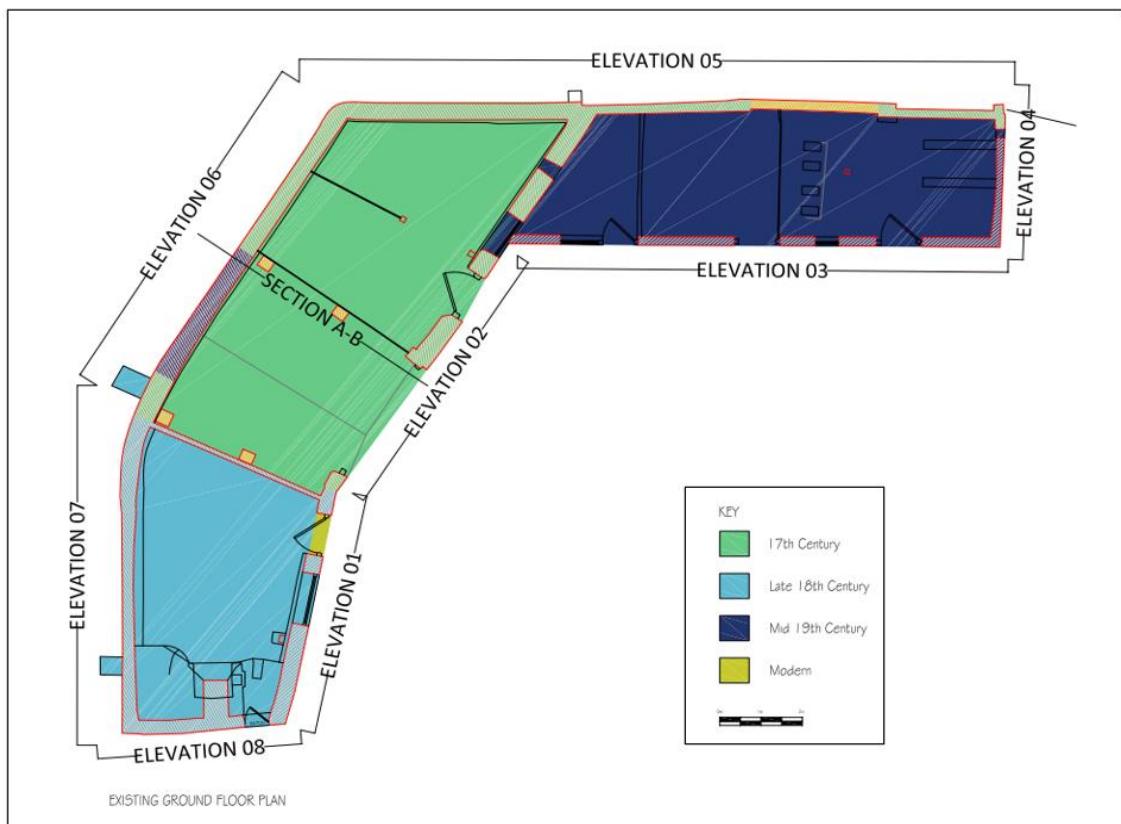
Phased ground-floor plan of the outbuilding at Bec House, showing estimated dates of component structures and built features (Fowler Architecture and Planning).
